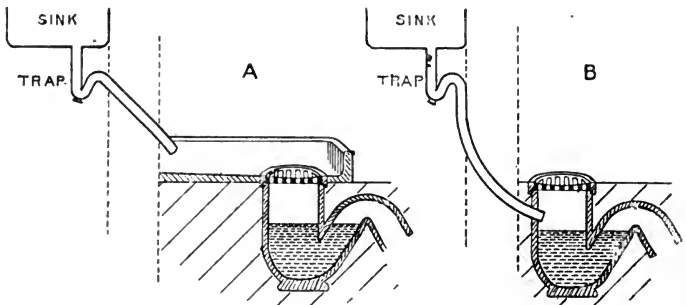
To show sink waste-pipe discharging : A over a channel leading to a gully, and B through a back inlet between the grating and the upper surface of the water in the trap. The latter is the better arrangement.
